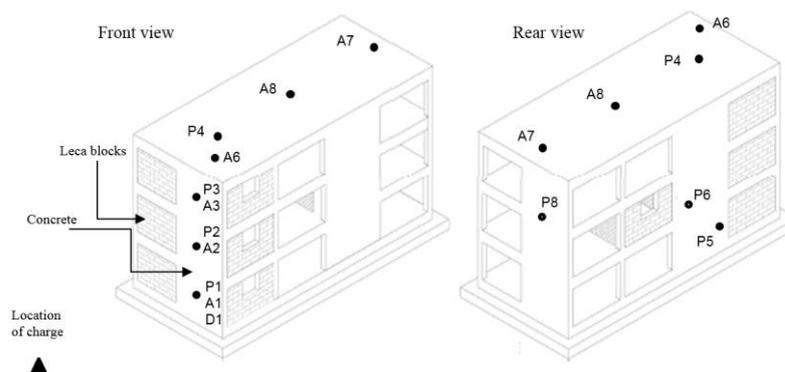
Isometric view of building. Location of pressure gauges, accelerometers, the displacement gauge and the explosive charge [6].
